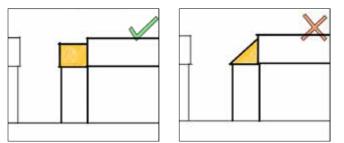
How to ensure that extensions adopt roof forms that match existing roof forms and pitches
